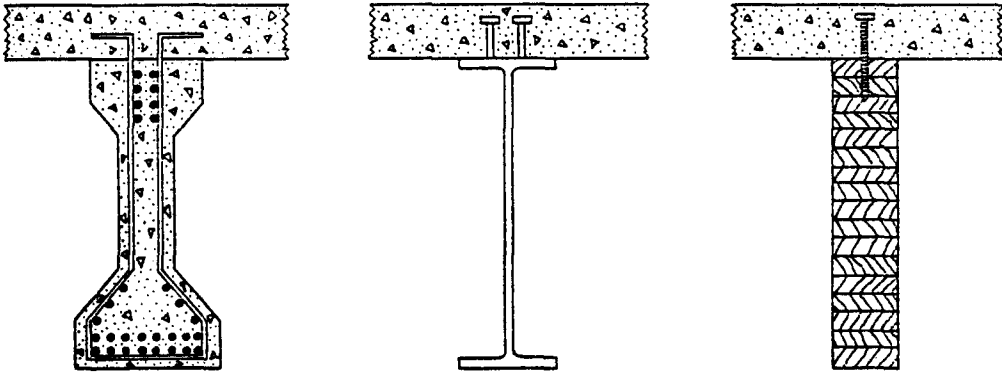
Typical composite structures of concrete, steel and wood used in bridge, building and shelter construction.
